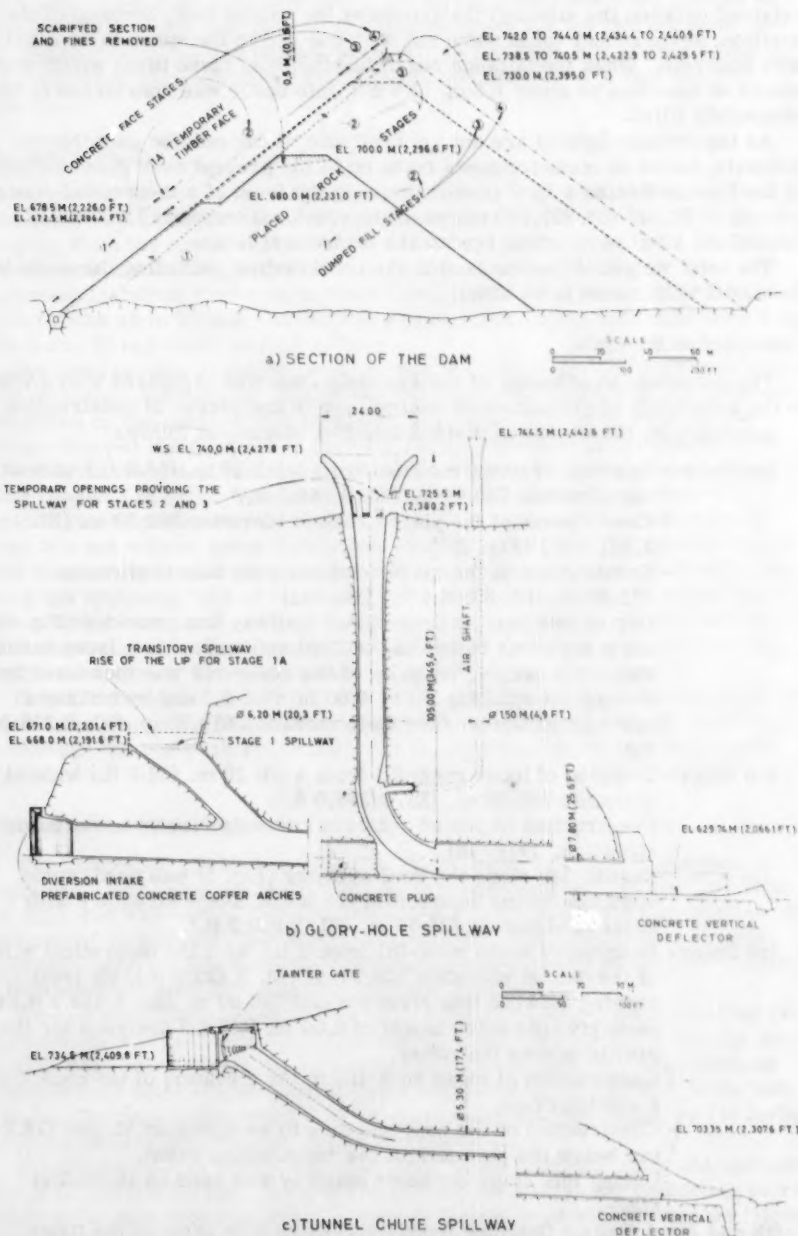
CONSTRUCTION STAGES. SPILLWAYS.
